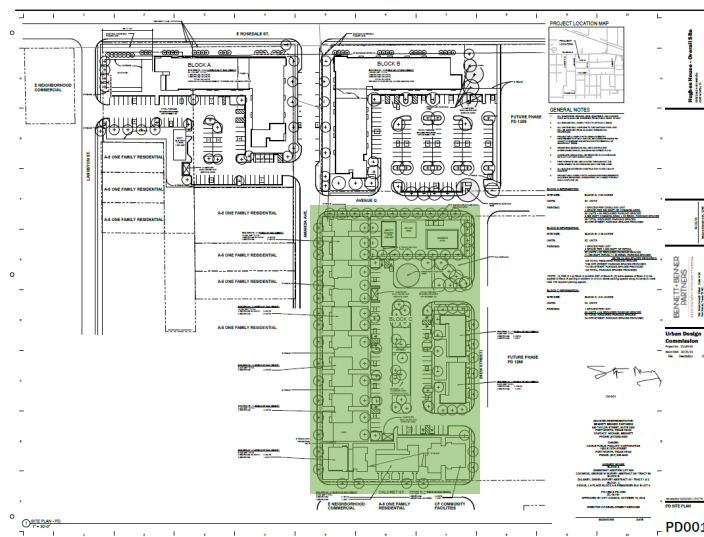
PD 1260: The requested amended are site plan area. The site plan was approved on 12/15/2021
